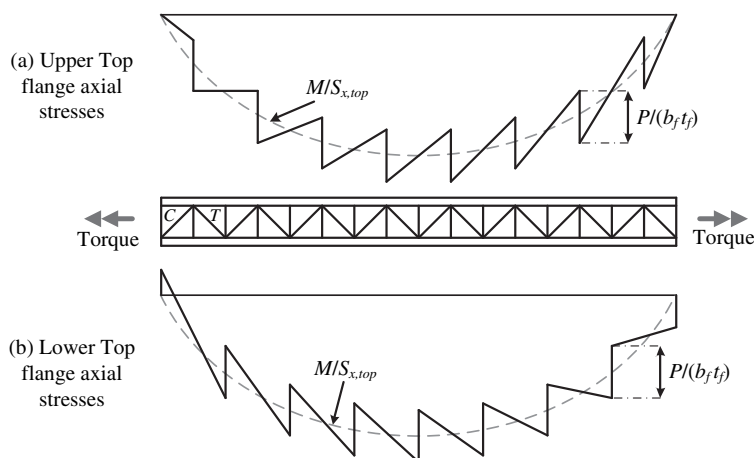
Interaction of forces between top flange lateral bracing and girder top flange for Warren and X-type layouts.
